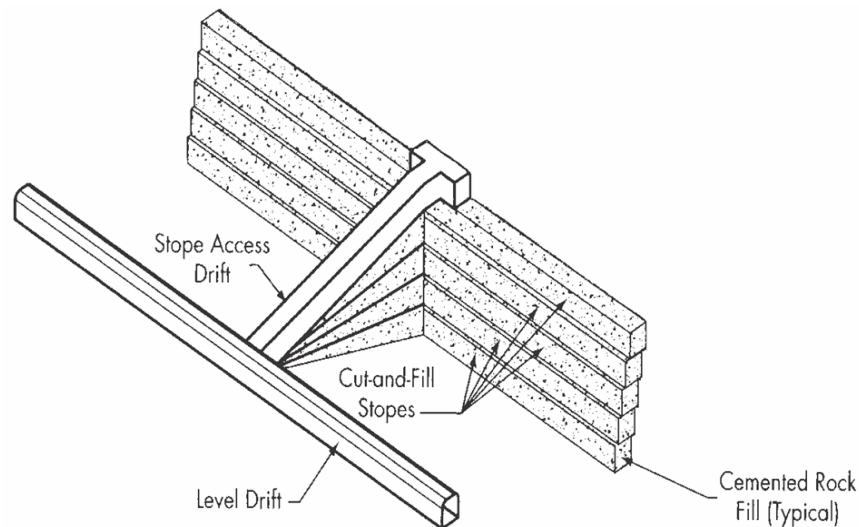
Typical Historic Overhand Mechanical Cut and Fill Stope – Isometric View
